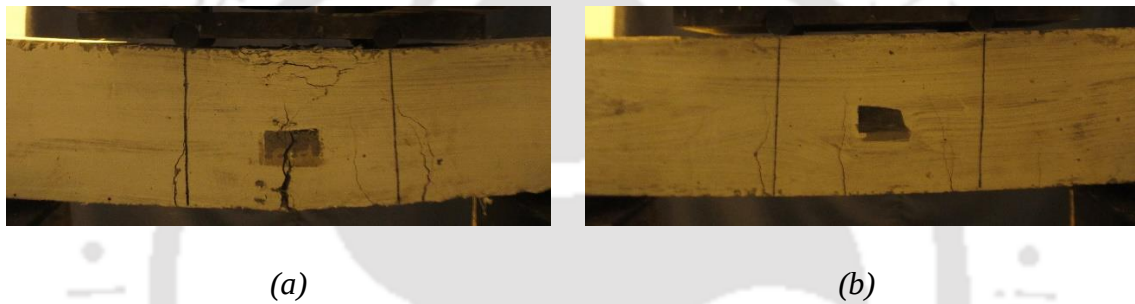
Failure pattern of specimen after test (a) conventional concrete (b) HyFRC
